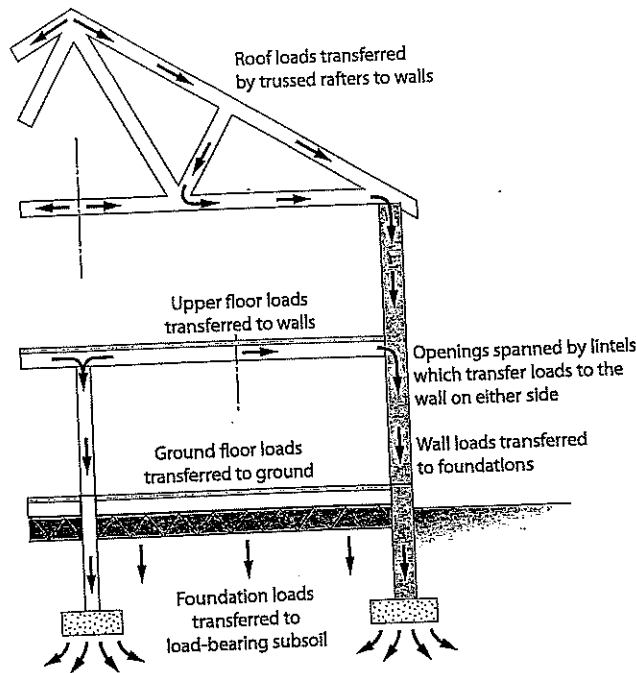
A dynamic load is transferred from the roof to the foundations through the walls and floors
